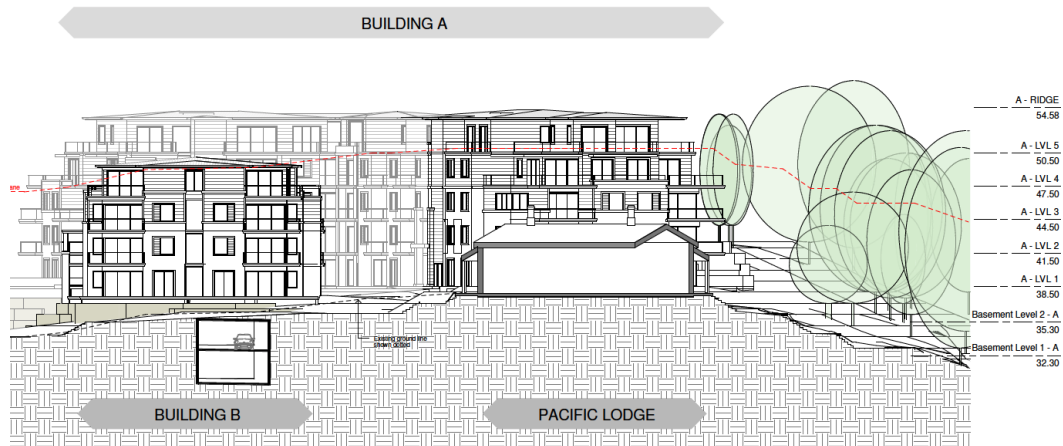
Proposed section (north facing, similar perspective to Figure 4)
